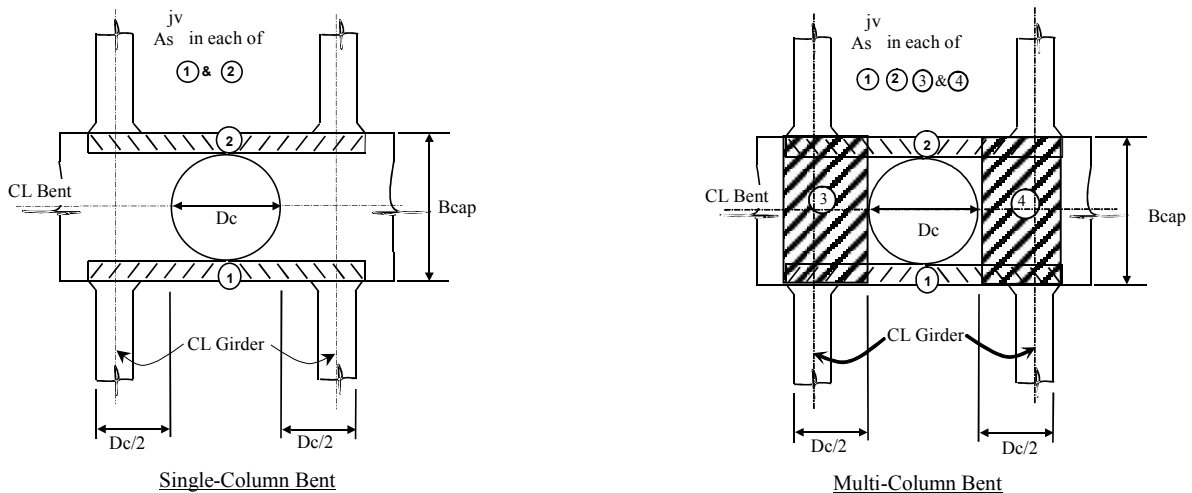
Location of Vertical Joint Reinforcement (Plan View of Bridge)
